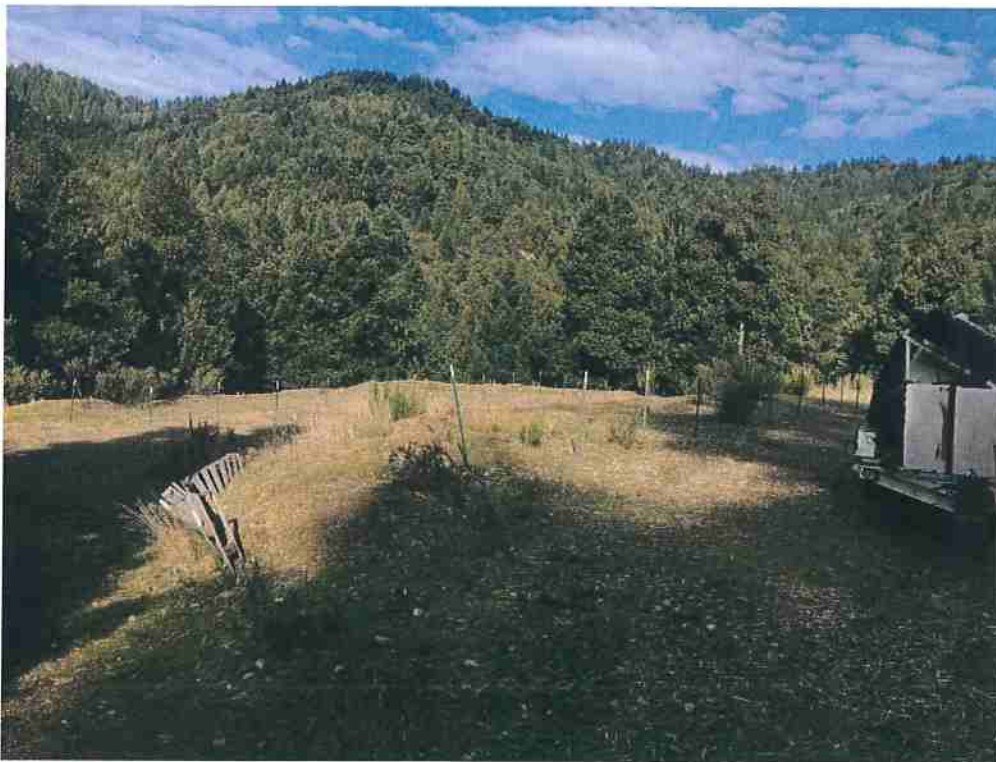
Conversion Site 3 – Erosion control structures surround site.
